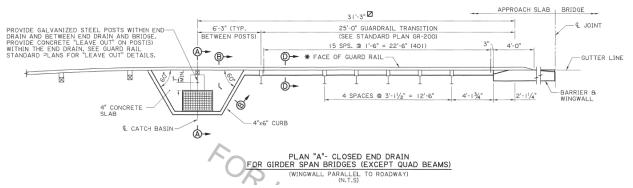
Standard Drawing for Bridge End Closed Drain–LA
